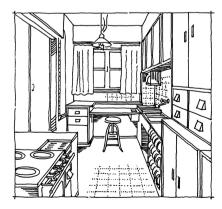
"Frankfurt kitchen" with furniture fixed to walls and a countertop under the window.
